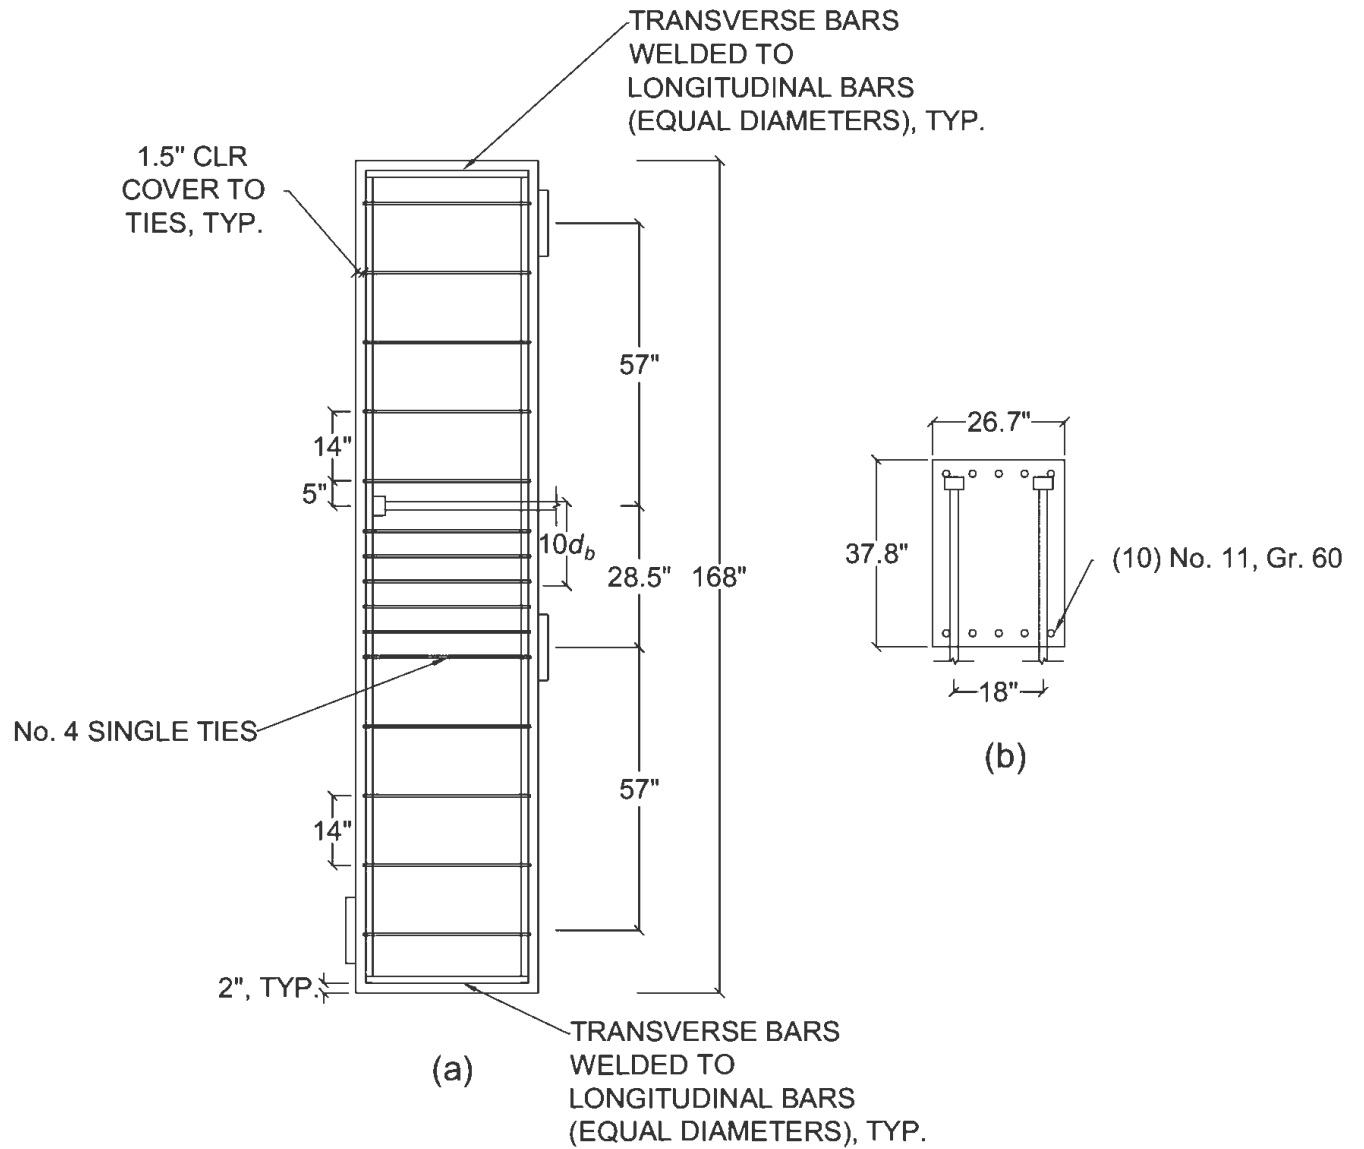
Details of reinforcement layout for No. 14 headed bar specimen 14-4: (a) elevation, (b) cross-section
